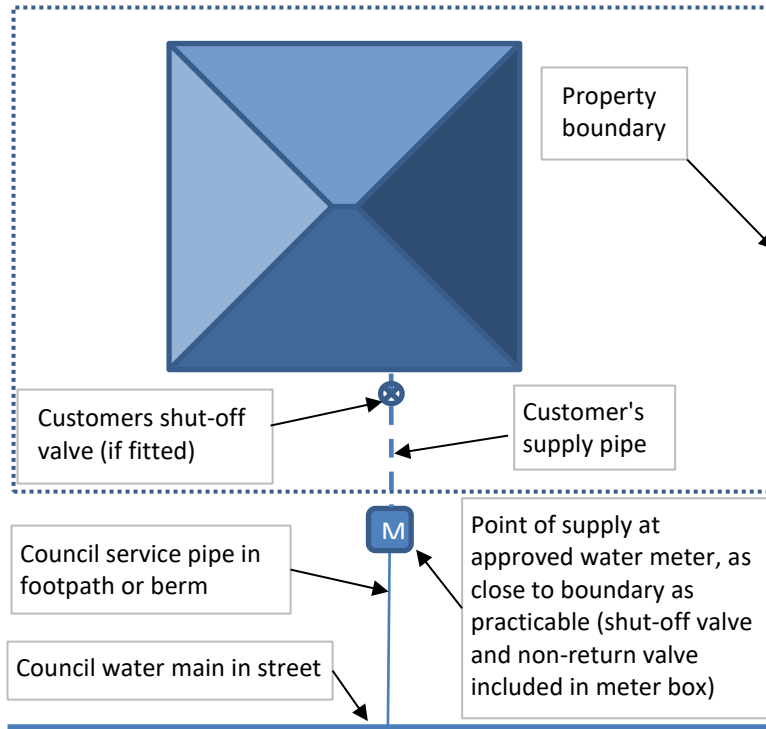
Typical Point of Supply-Restricted Flow-Outside Premises
